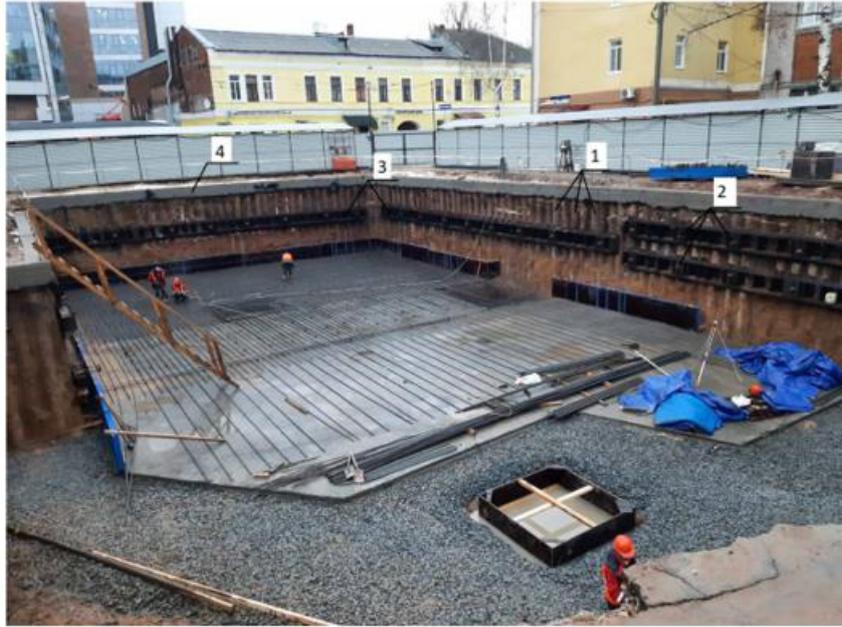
A: Fragment of the pit fencing plan: 1-boroinjective ERT piles; 2-ground ERT anchors; 3-anchor strapping belt; 4-monolithic reinforced concrete strapping belt.
